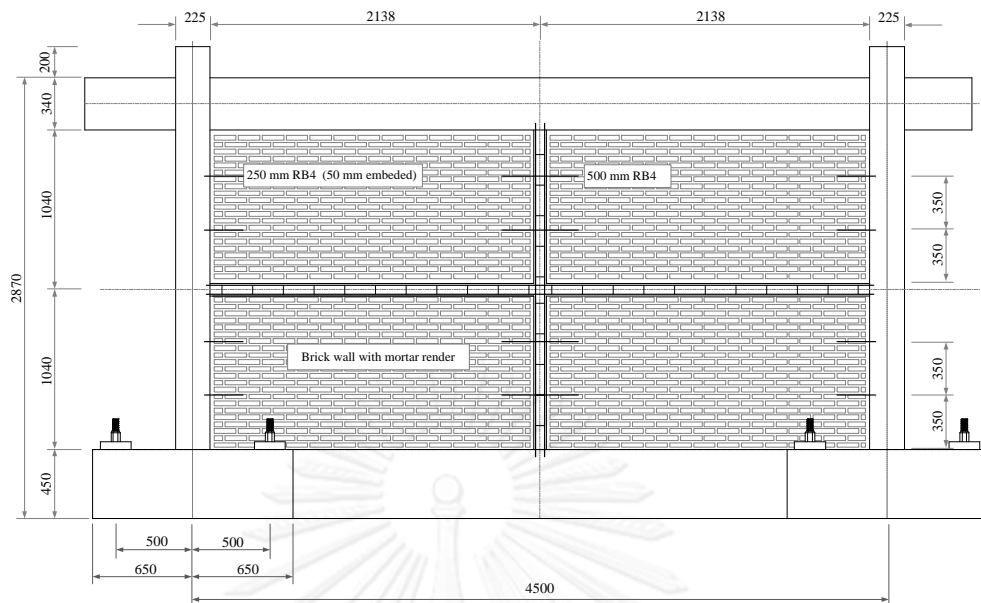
The infill panel detailing of test specimen MIRCFO1
